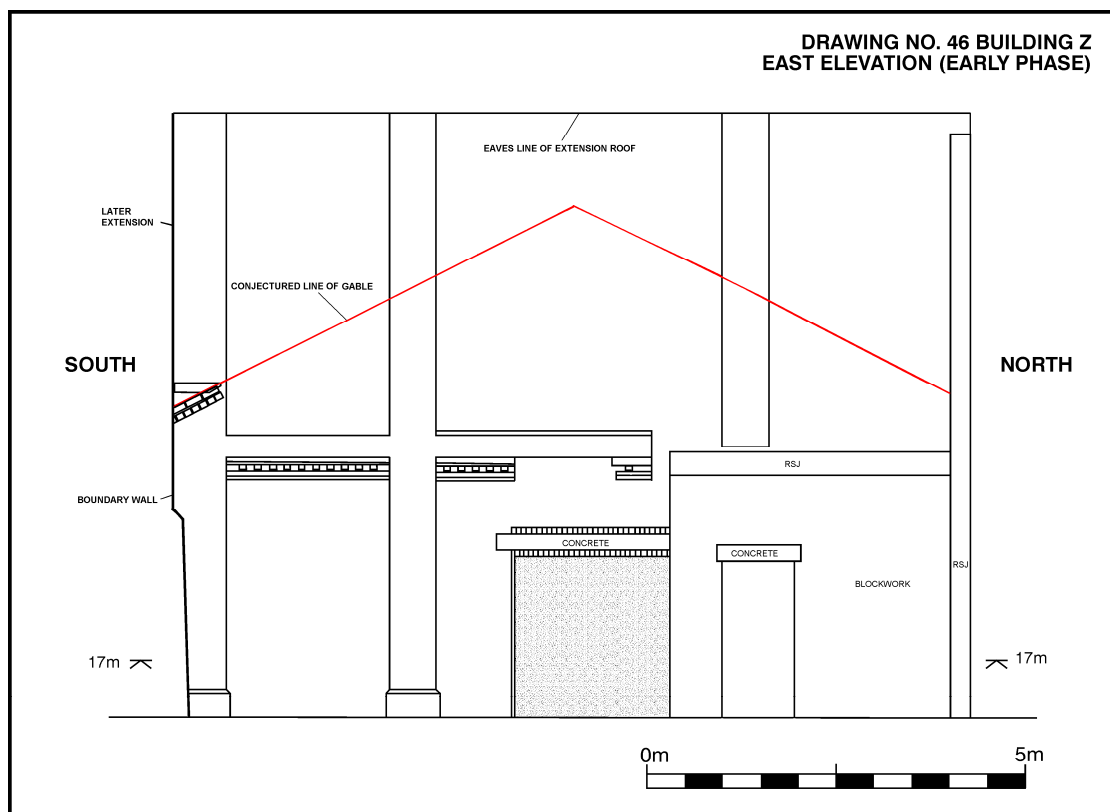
East elevation of the New Mould Shed in Building Z (scale 1:100)
